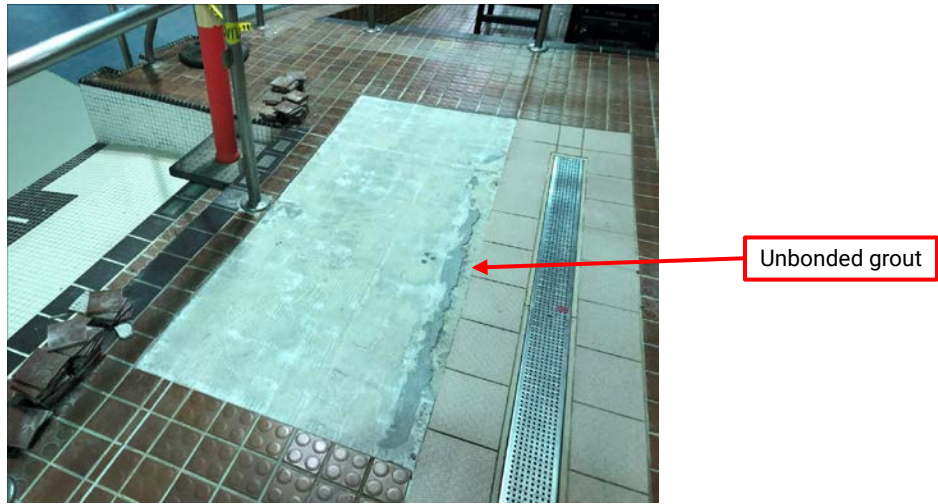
Spalled grout sloping material at Tile Removal Area F
